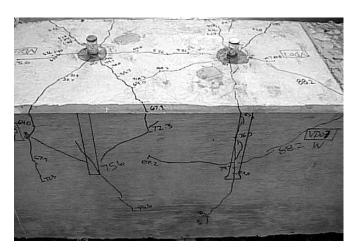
Crack Pattern at Failure for Straight and Headed Bars (12-in. embedment)
